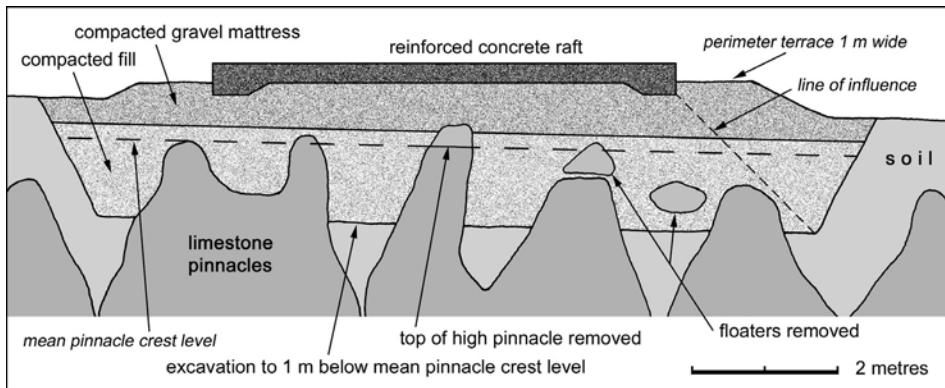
An engineered gravel mattress that extends over bedrock pinnacles and intervening soil-filled fissures.
